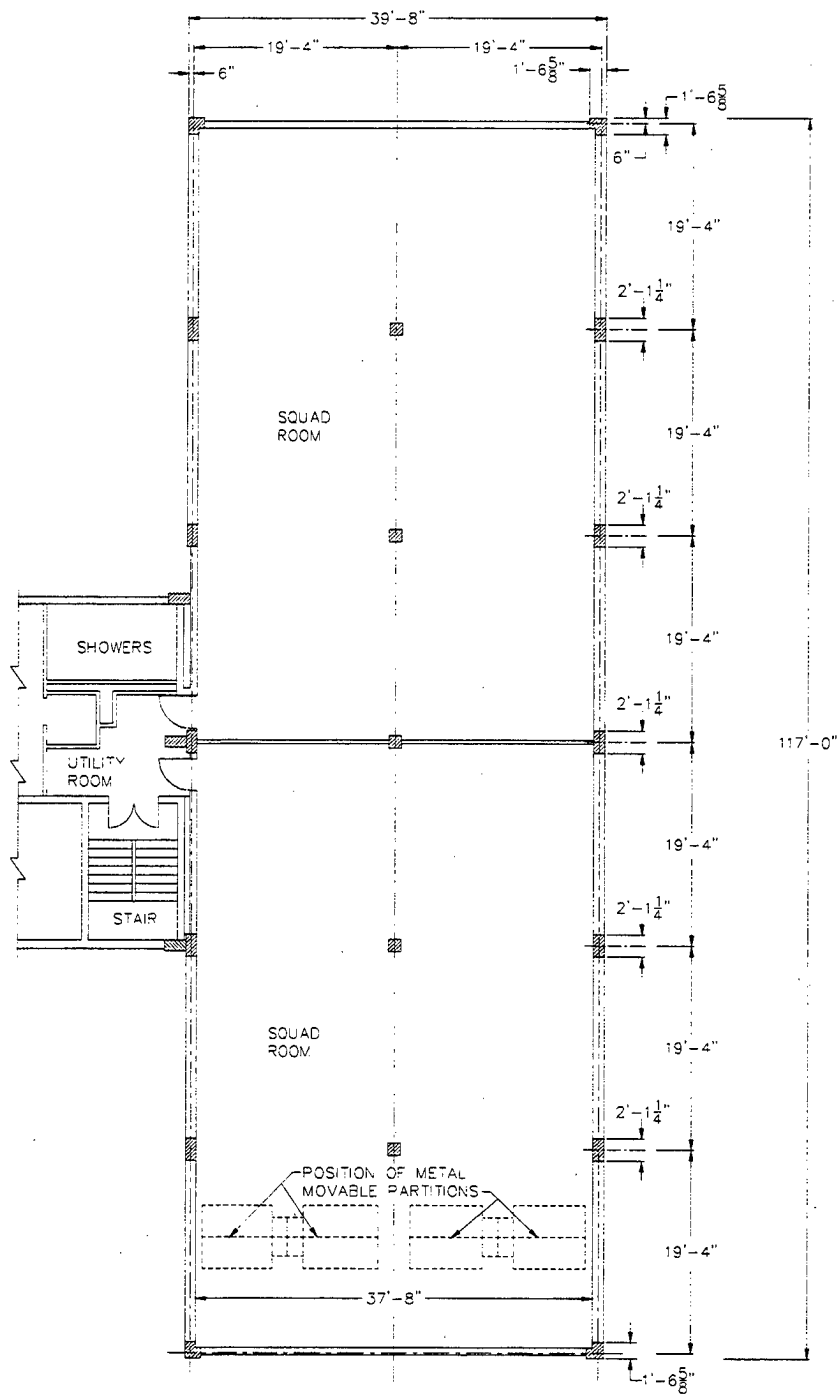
As-Built Drawings of Prototype Building, Second and Third Floor Plans
